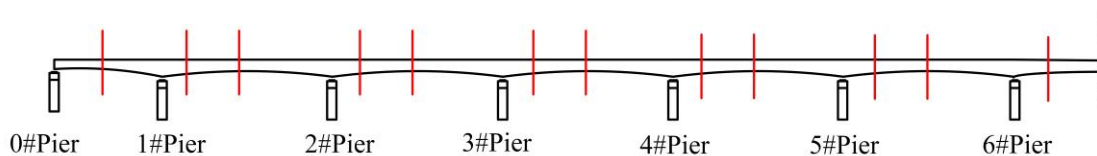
Layout diagram of stress testing sections for Continuous Beam 1/2
